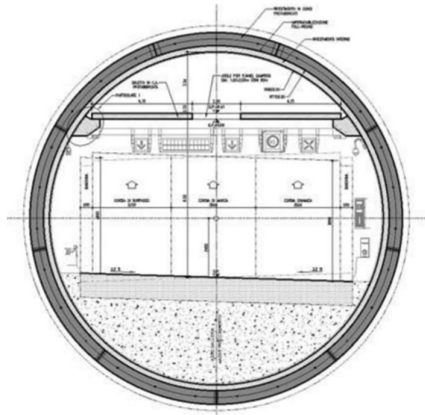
Cross section of the tunnel (Autostrade per l'Italia, 2021)
